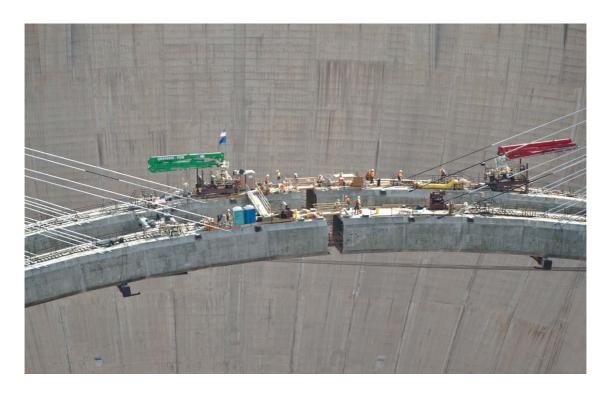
ROAD& BRIDGE CONSTRUCTION hazard (9)
